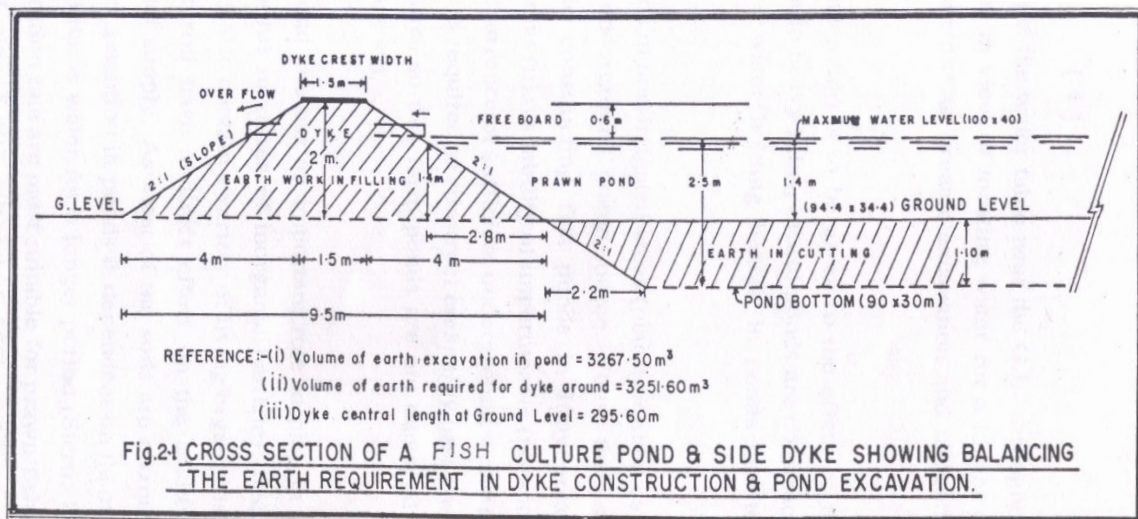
Cross-section of a fish culture pond and side dyke showing balancing. The earth requirement in dyke construction and pond excavation
